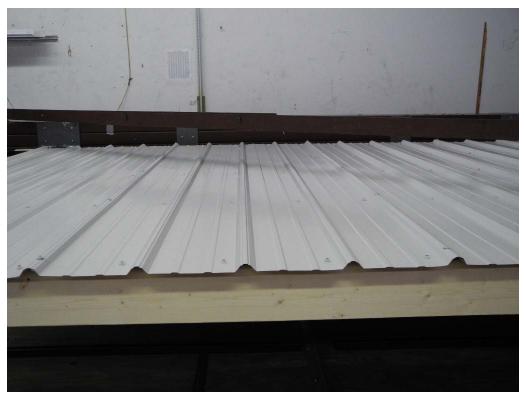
View of the panel fasteners at end and interior supports. (DSCN1012)
